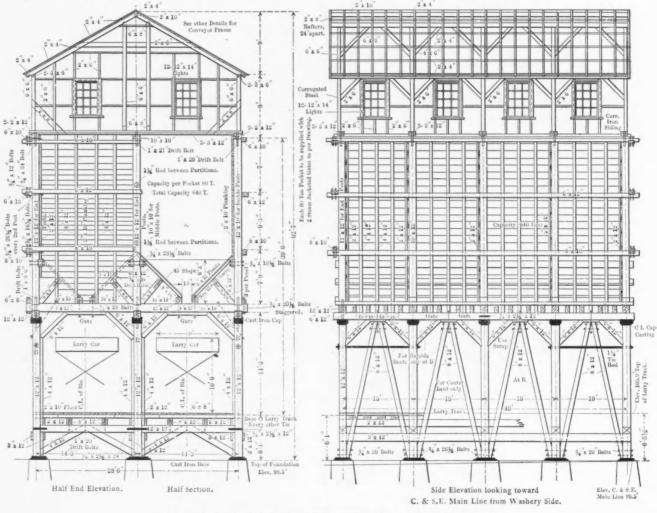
FIG. I. DETAILS OF END AND NORTH ELEVATION OF WASHERY BUILDING
